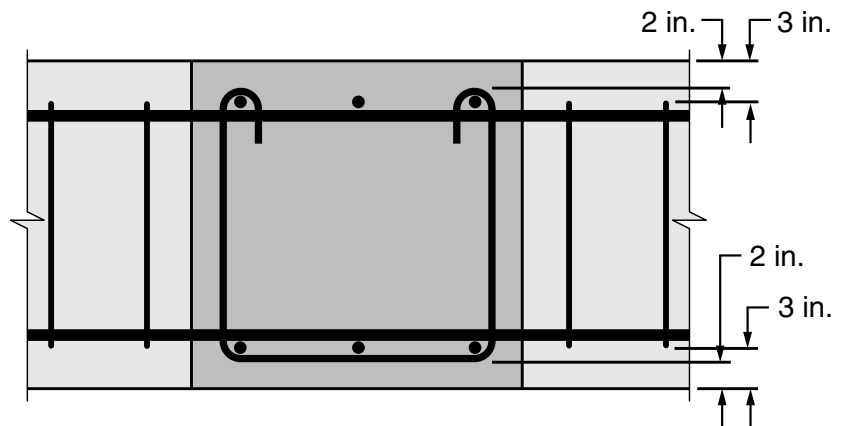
The designer must establish the layering of reinforcing at intersecting beams. The addition of required cover values will add clarity to the construction documents.
